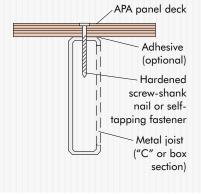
TYPICAL PANEL-TO-METAL FRAMING SYSTEMS
